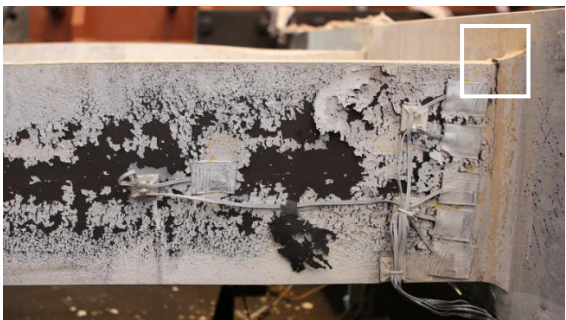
Specimen W4: East Beam Top Flange CJP Weld Fracture at -0.04 rad (2^{nd} Cycle)
